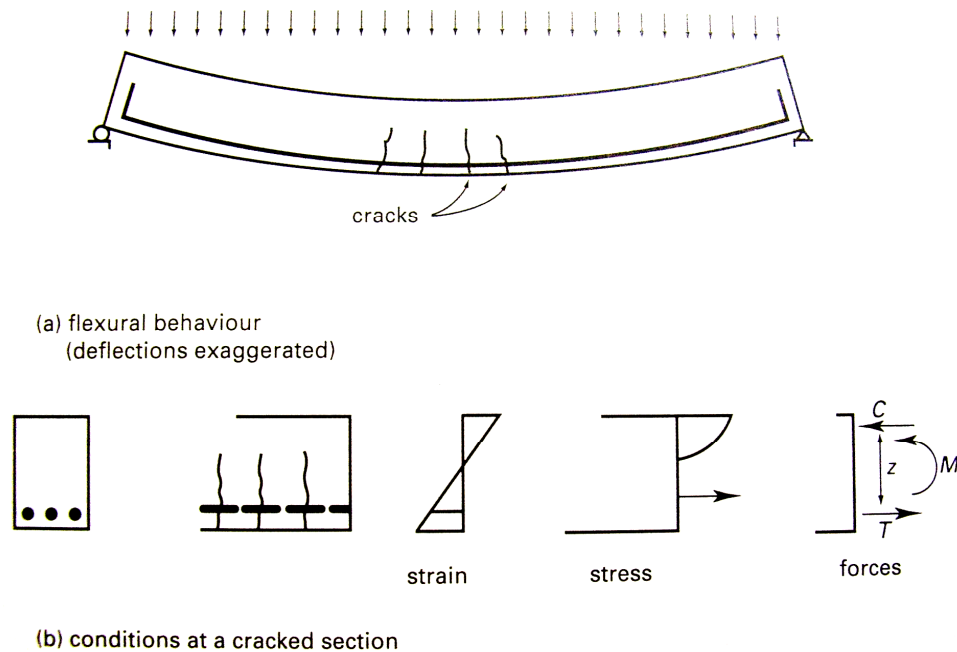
Reinforced concrete beam in bending (Warner RF, et al., 1998)
